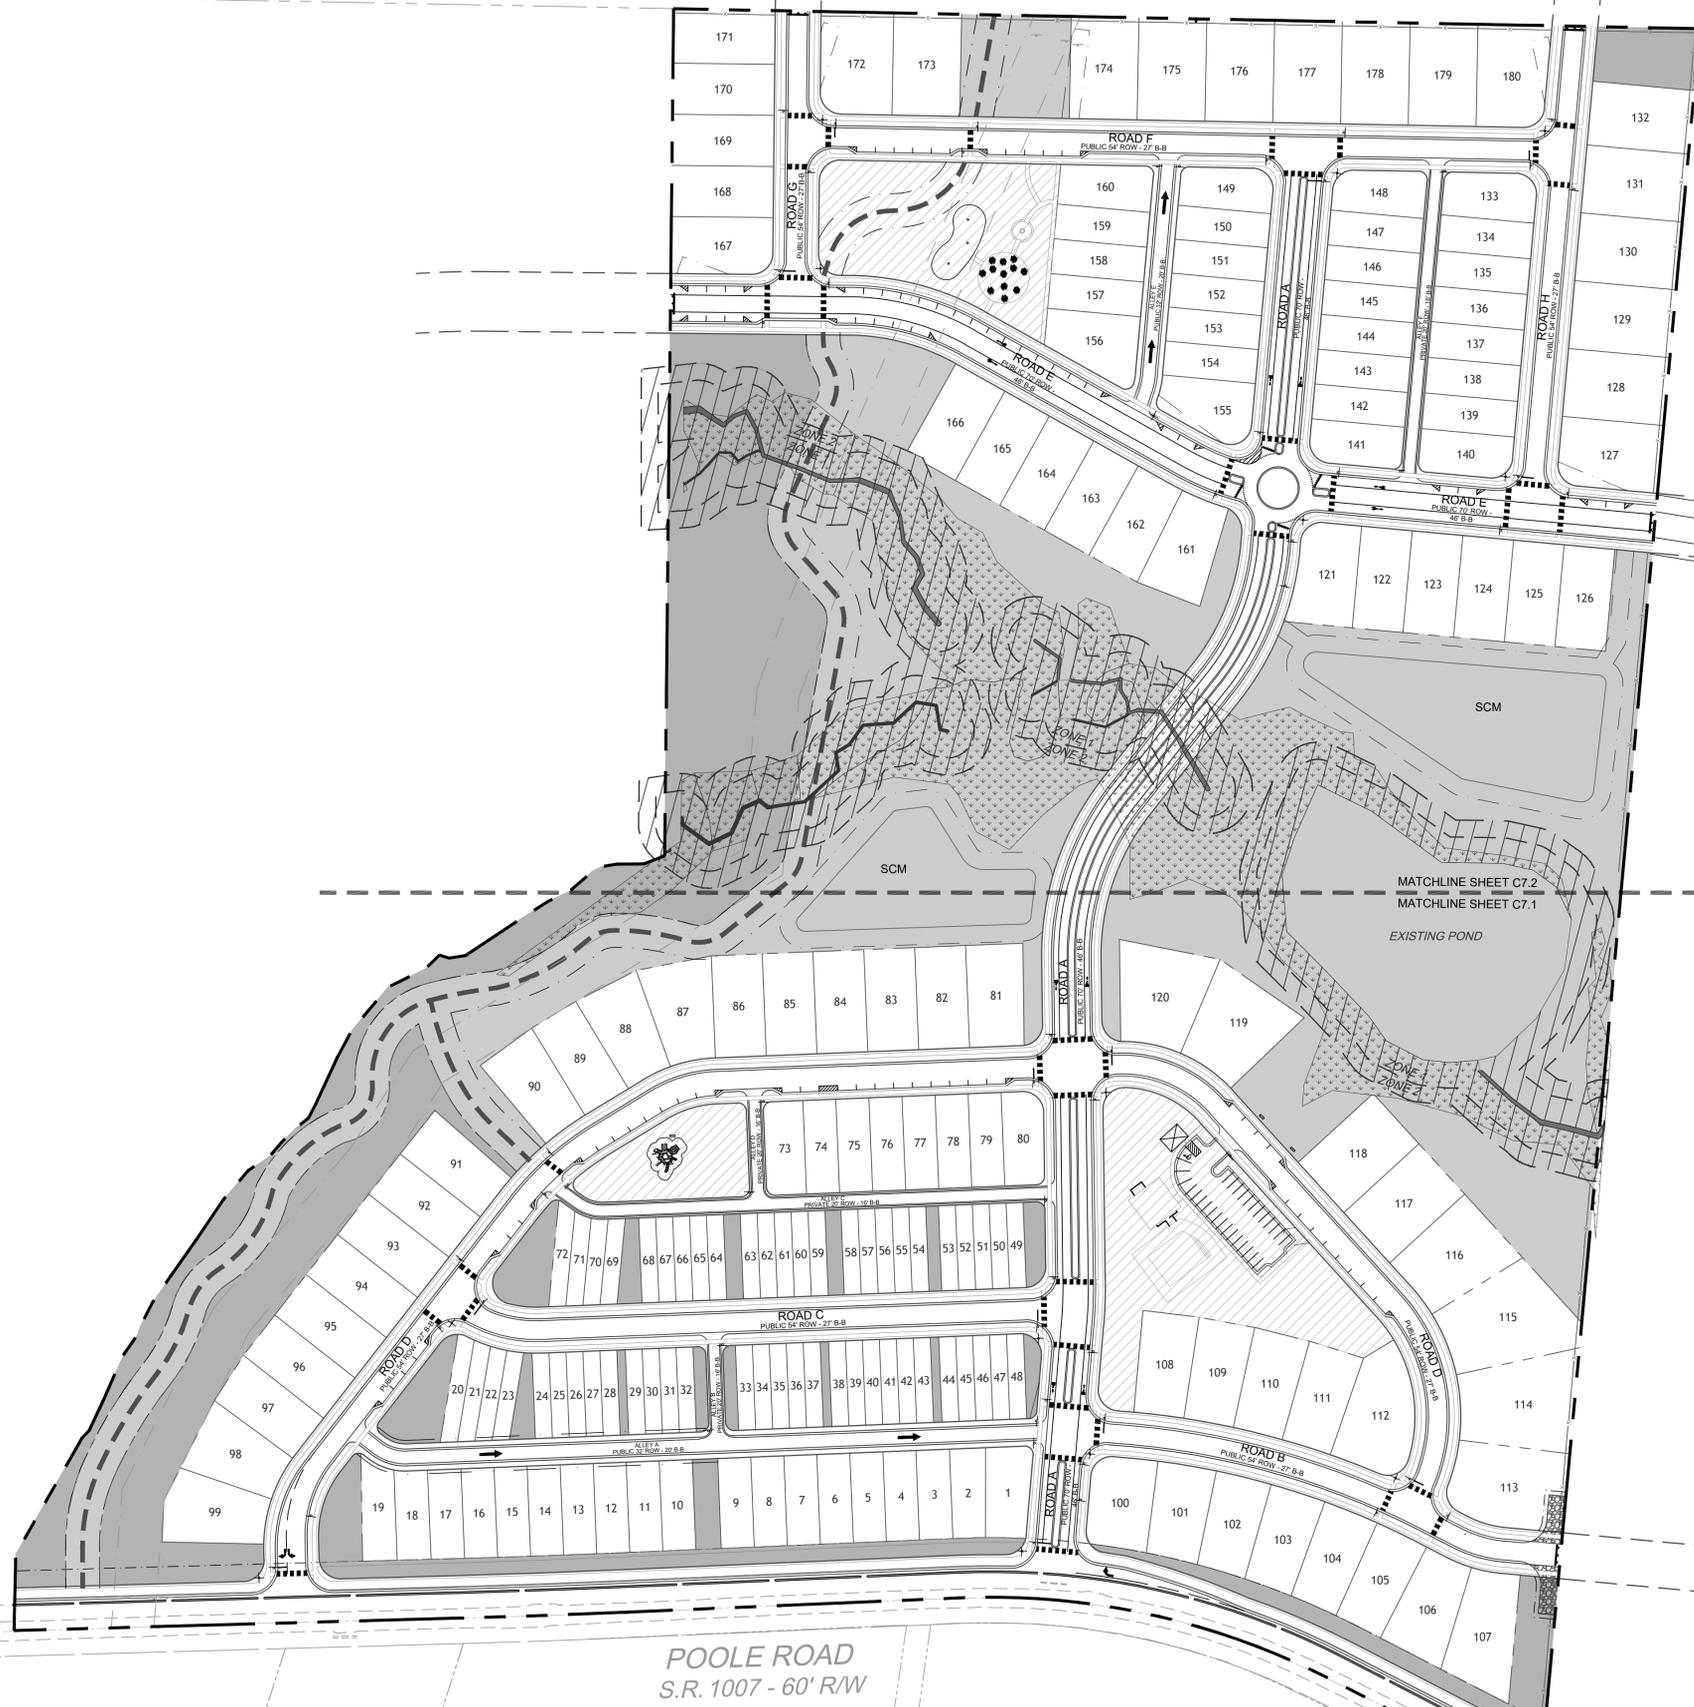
DETAILED LANDSCAPE PLAN SHEET 2 OF 2
